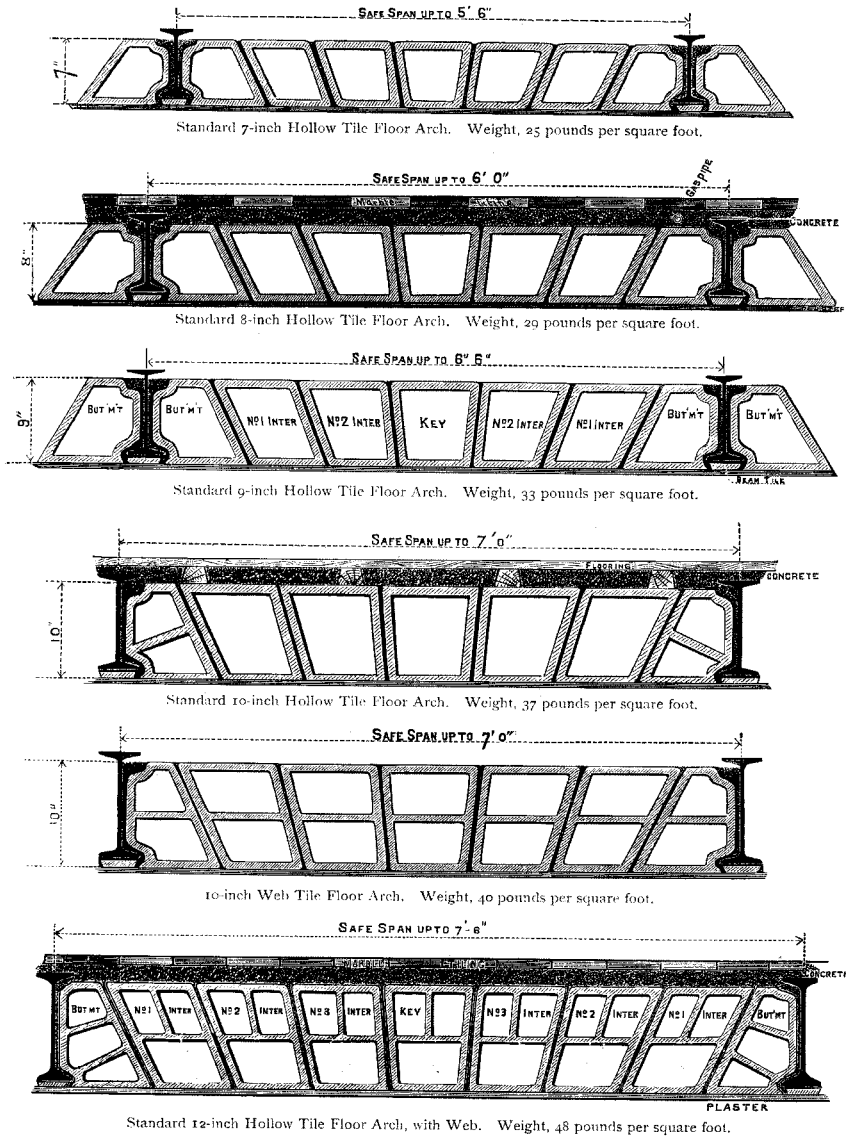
Late nineteenth century flat hollow tile floor arches (from Pioneer Fire-Proof Construction Co., *Hollow, Solid and Porous Tile for Fire-Proofing Buildings*, 18).
